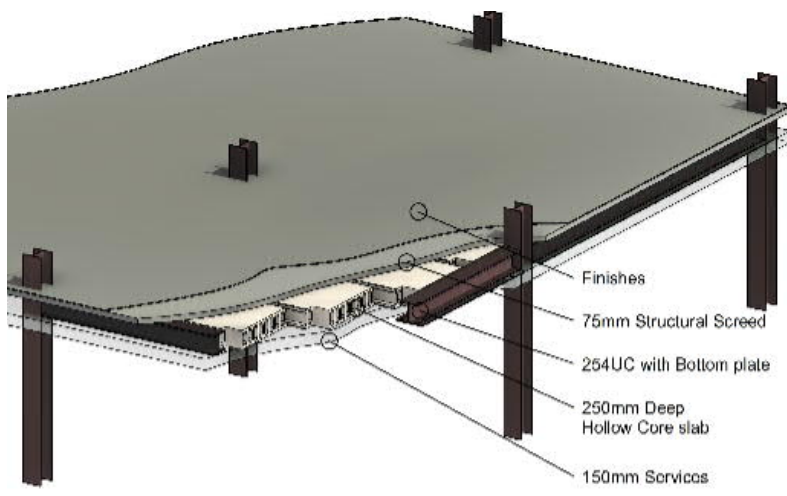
Slim Floor Construction, Overall Depth 525 - 550mm
